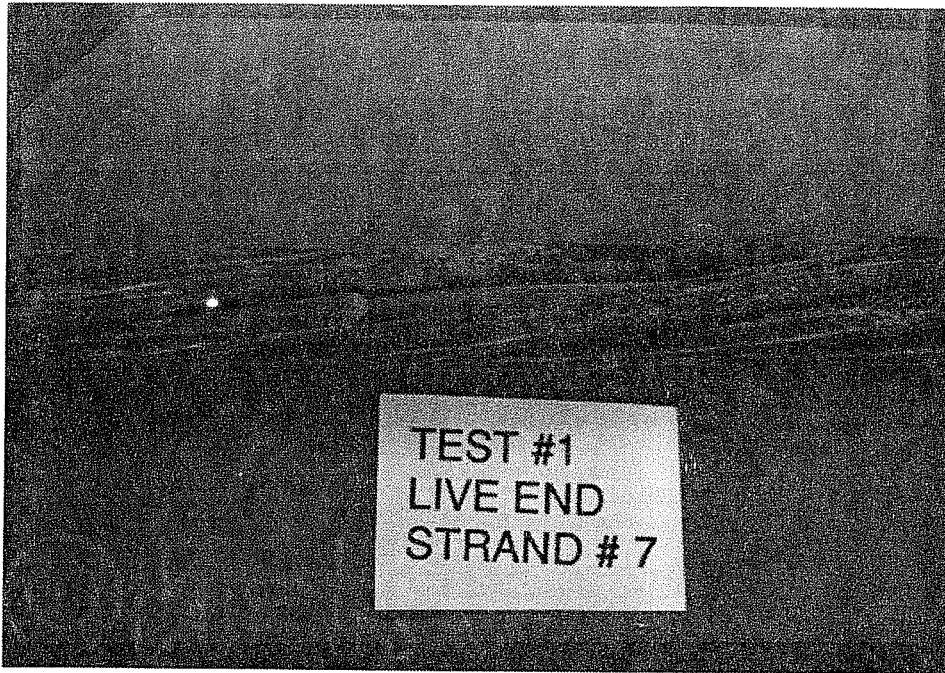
Photograph of a Test #1 wire fracture with a slightly angled fracture surface.
